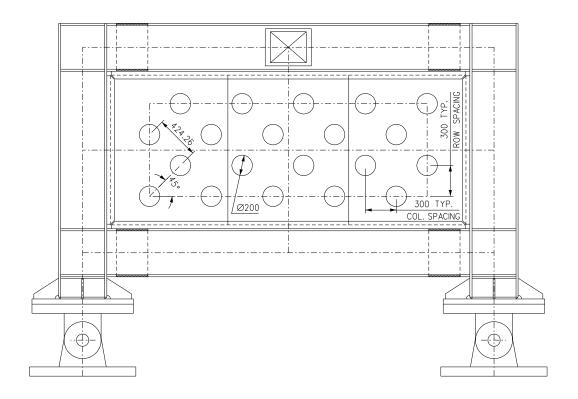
Specimen P (Vian and Bruneau 2005)
